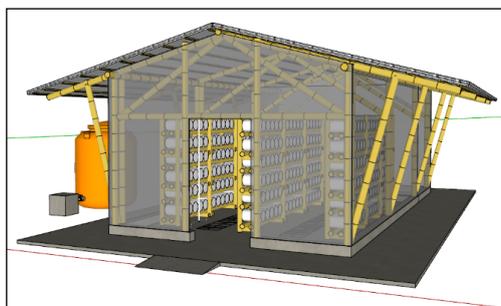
The bamboo structure of the mushroom house proposed by the team
